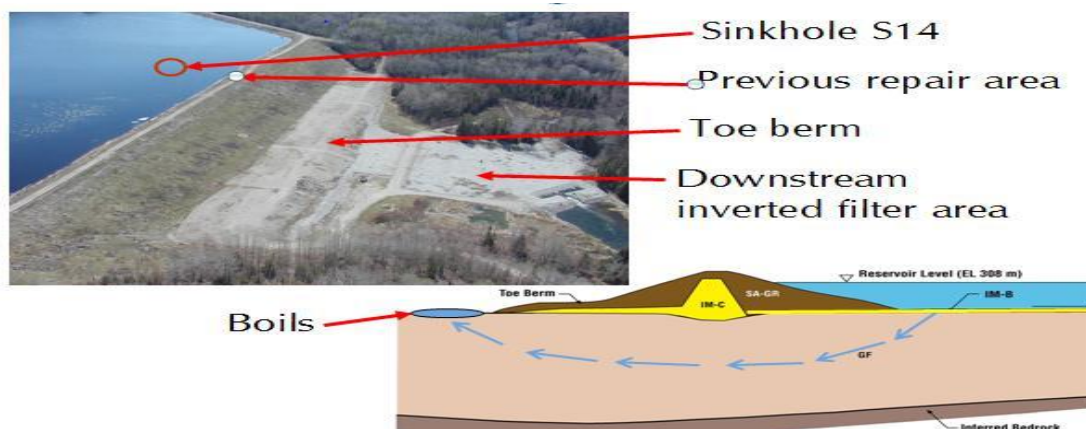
Shikwamkwa Dam: showing damage, filtered toe berm and section of erosion pipes [10]
